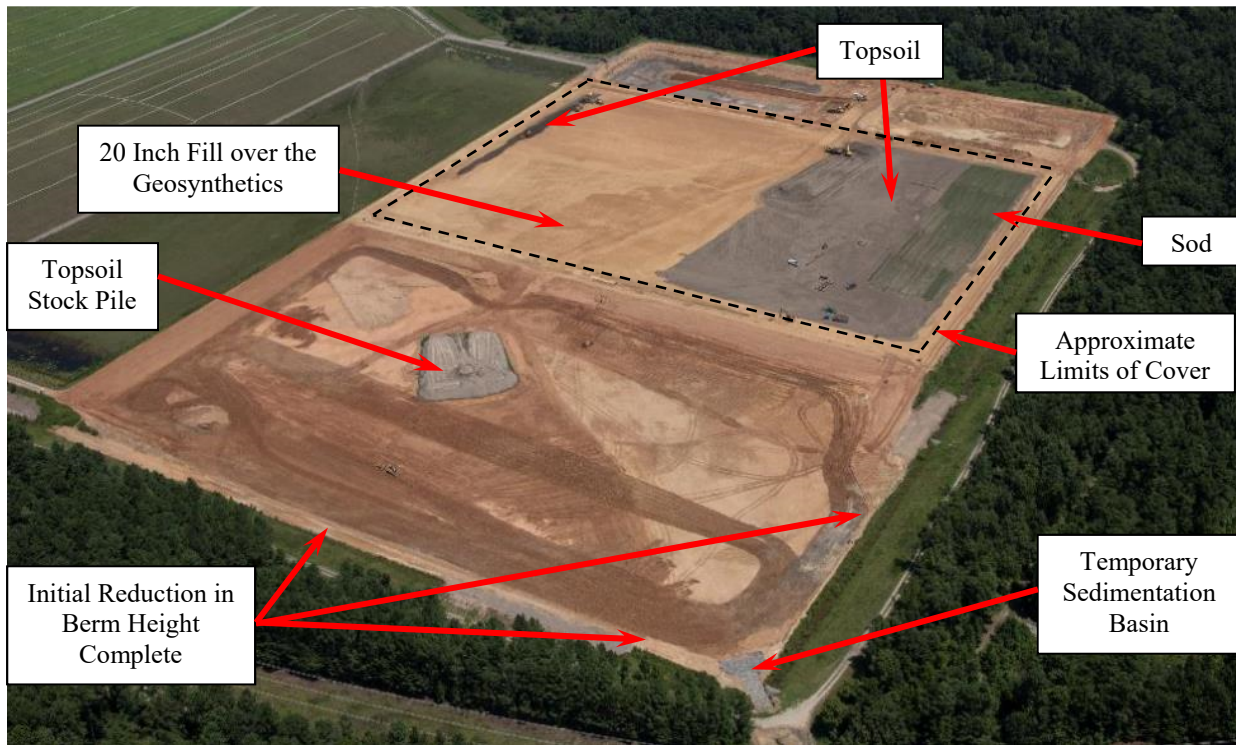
Aerial View of 488-1D Ash Basin (August 8, 2018)
